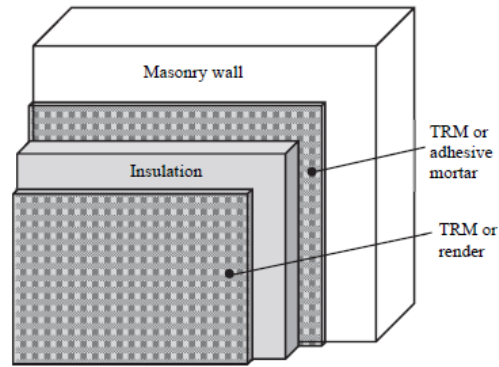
Schematic view of proposed structural and energy retrofitting system on one side of the masonry wall.
